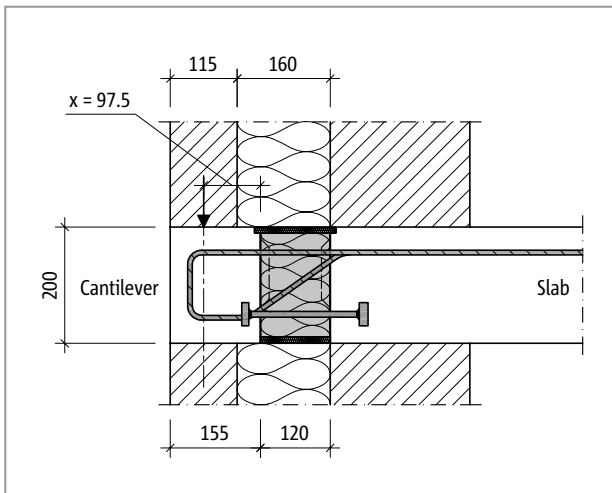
Schöck Isokorb® XT type O: Wall construction for design example
